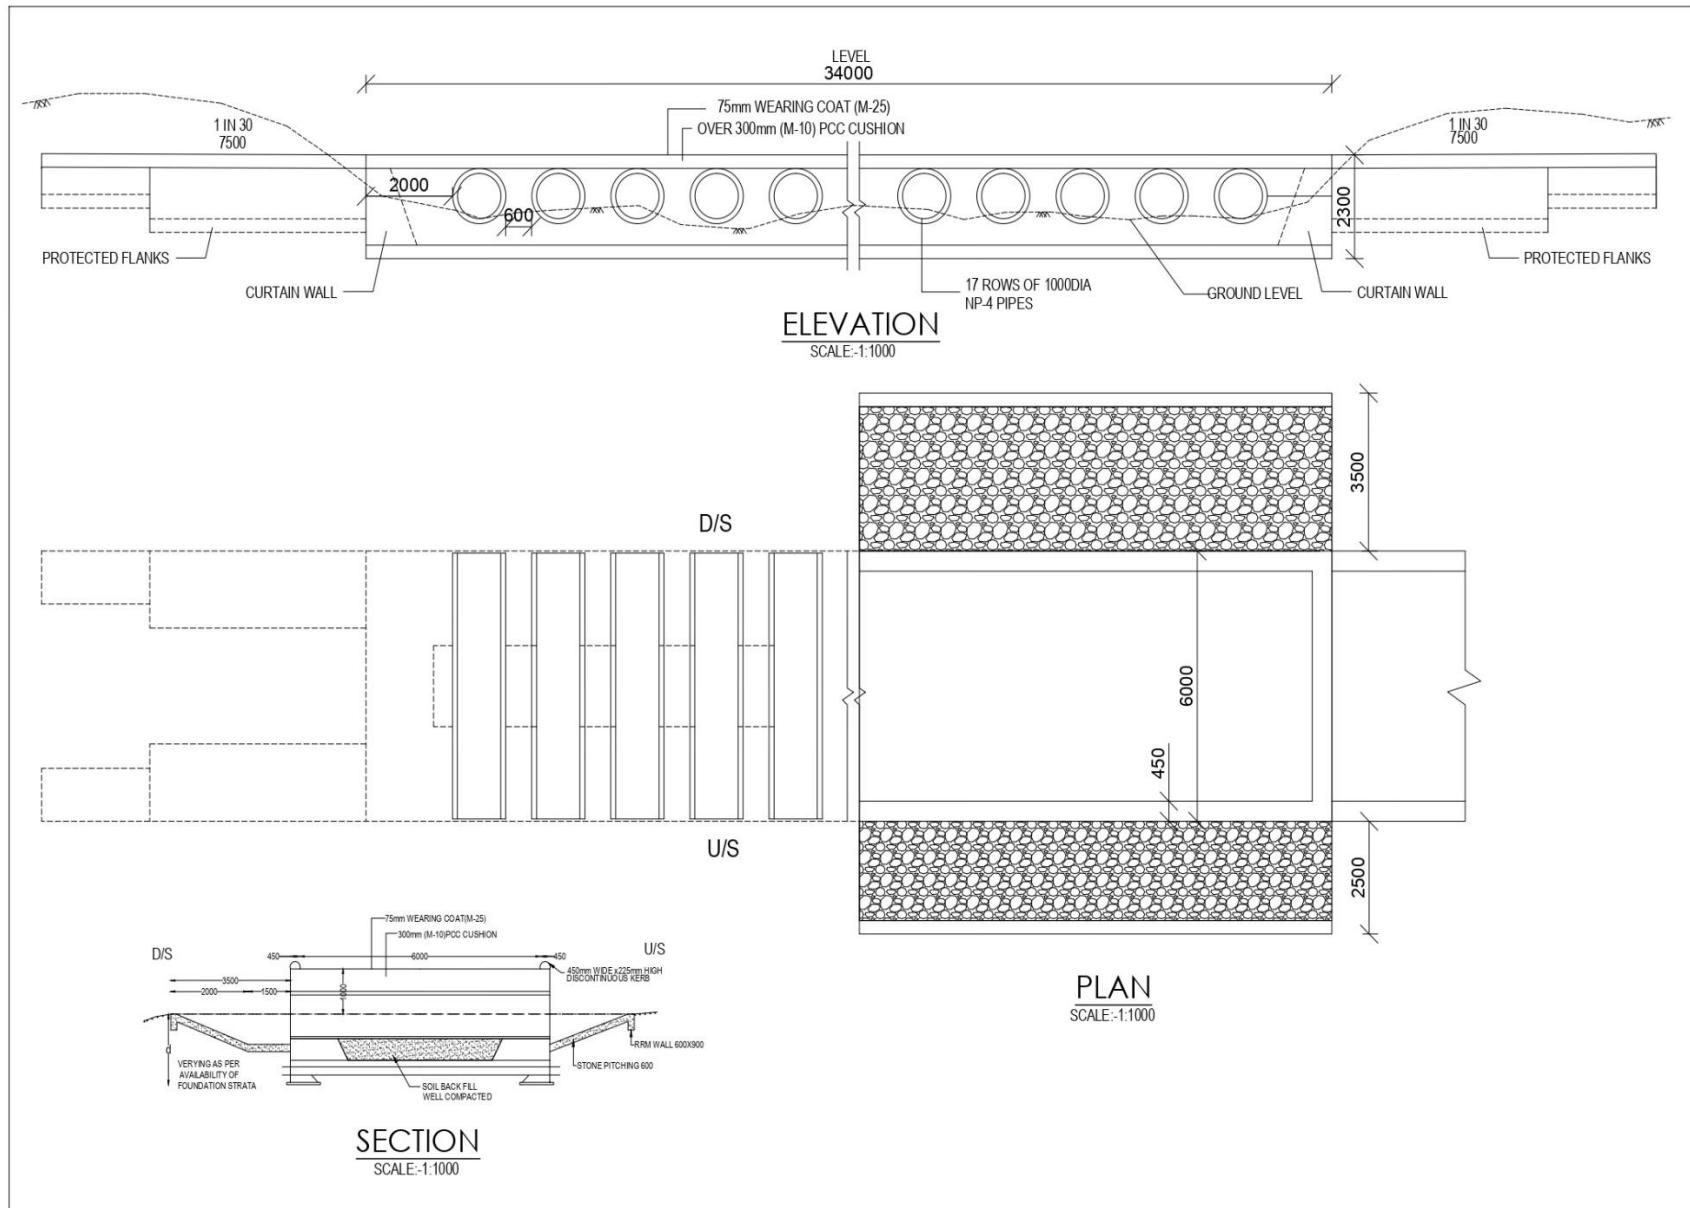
Details of vented causeway (Appendix 7.2)
